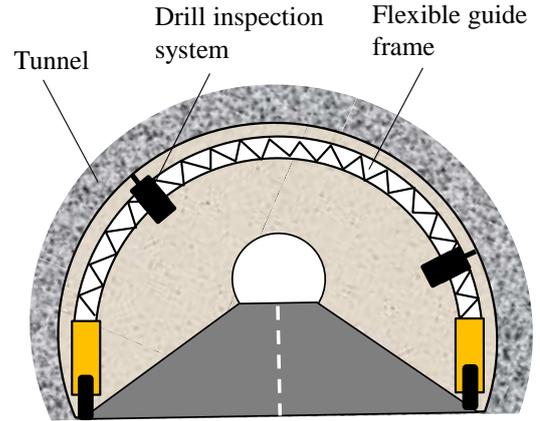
Application plans of tunnel inner wall inspection system using flexible guide frame with grinding drill
